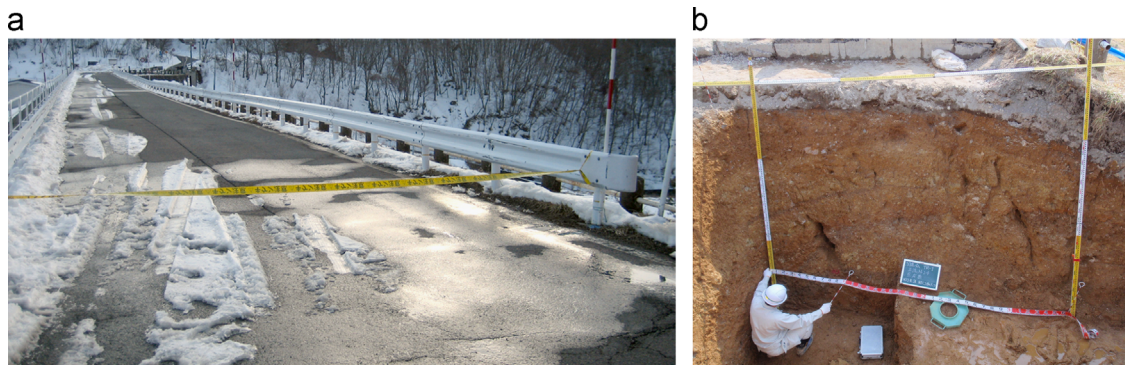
(a) Crack of asphalt pavement road on the crest of the Hatori dam and (b) trench investigation at the cracks on the crest of dam (Tohoku Regional Agricultural Administration Office).
